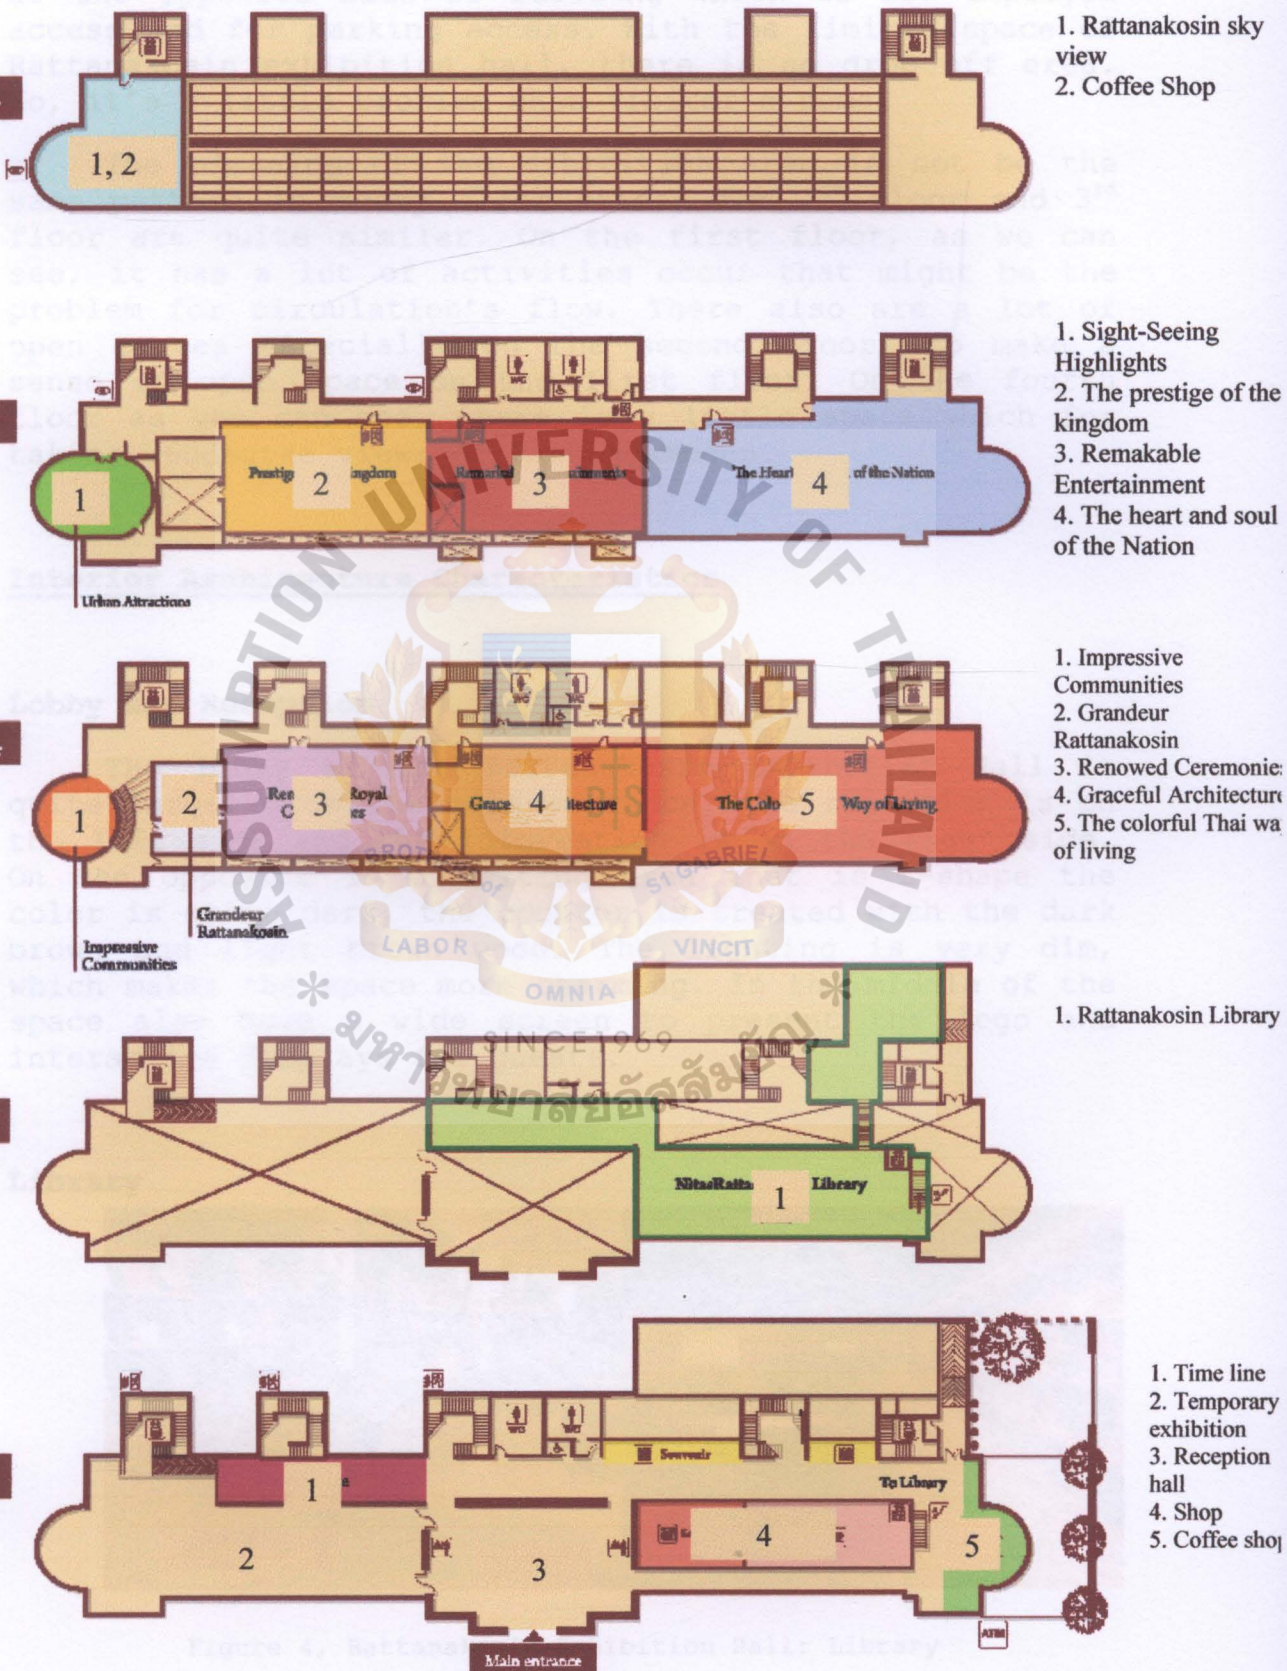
, Rattanakosin Exhibition Hall: Layout plan
